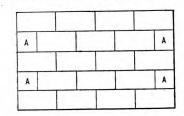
Showing Little Better Construction than Indicated in Fig. 1.
